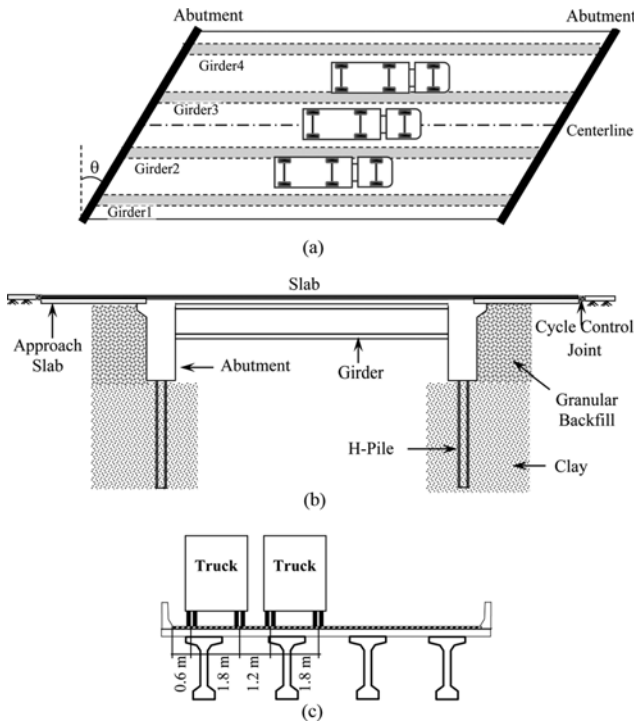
(a) Plan View of a Typical Single Span SIB under Truck Loading, (b) Elevation View of the SIB, (c) Typical Slab-on-girder Bridge Cross-section and Minimum Clearances Under Truck Loading
